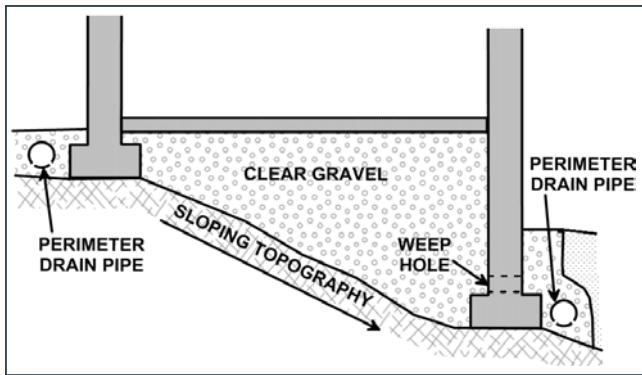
Best practice underslab and perimeter drainage configuration for a building on sloping topography.
